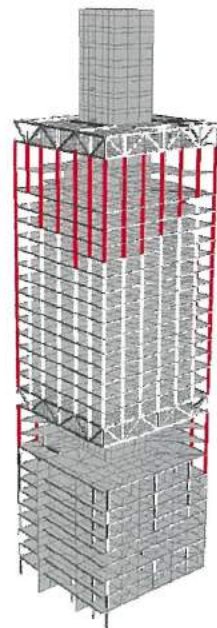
Columns subjected to tension forces and mechanically coupled column splices
